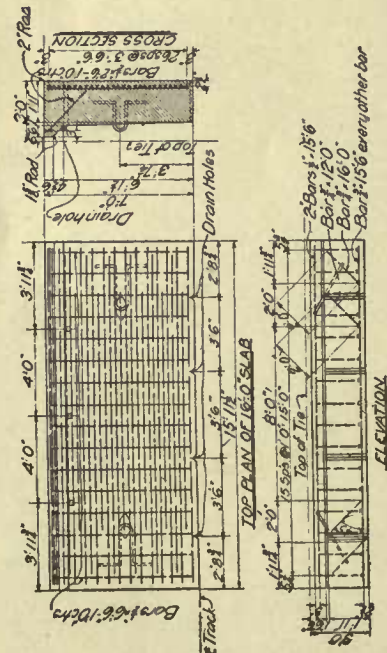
PLATE LXVI.—STANDARD CONCRETE TRESTLE, CHICAGO, BURLINGTON & QUINCY RAILROAD.
